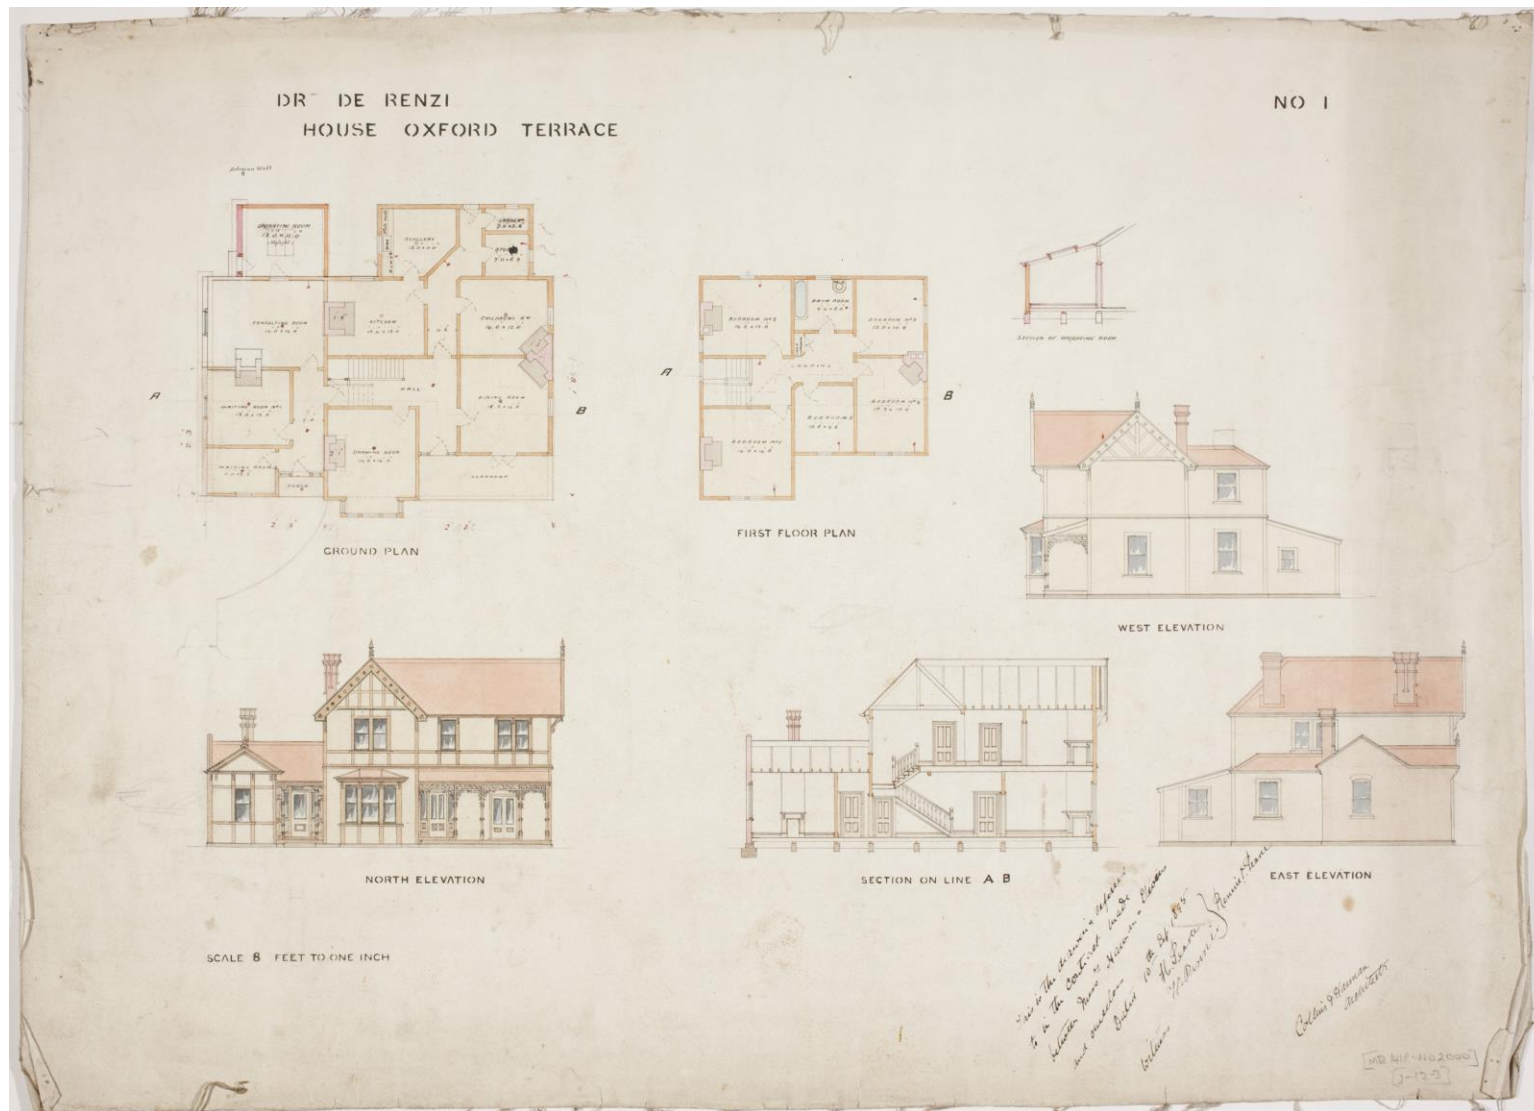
Collins and Harman, Dr De Renzi, House, Oxford Terrace, plans, elevations and section (1895).
